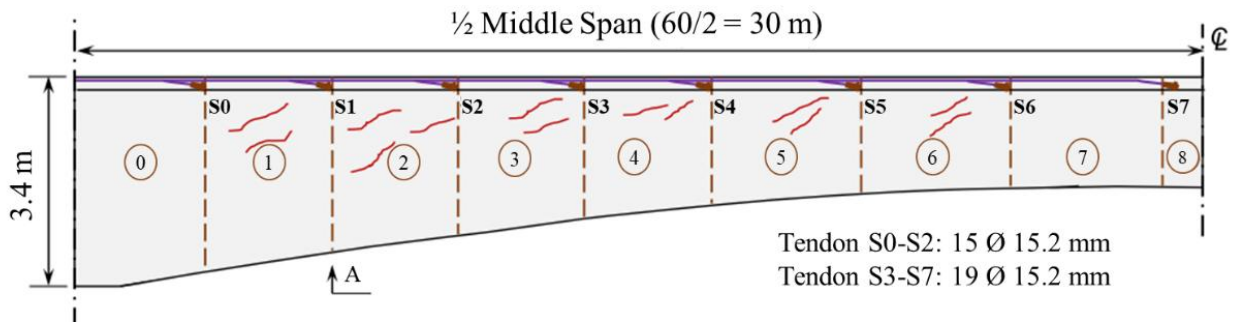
Crack Pattern Due to Horizontal Shear Stress on Web Box Girder [3].
